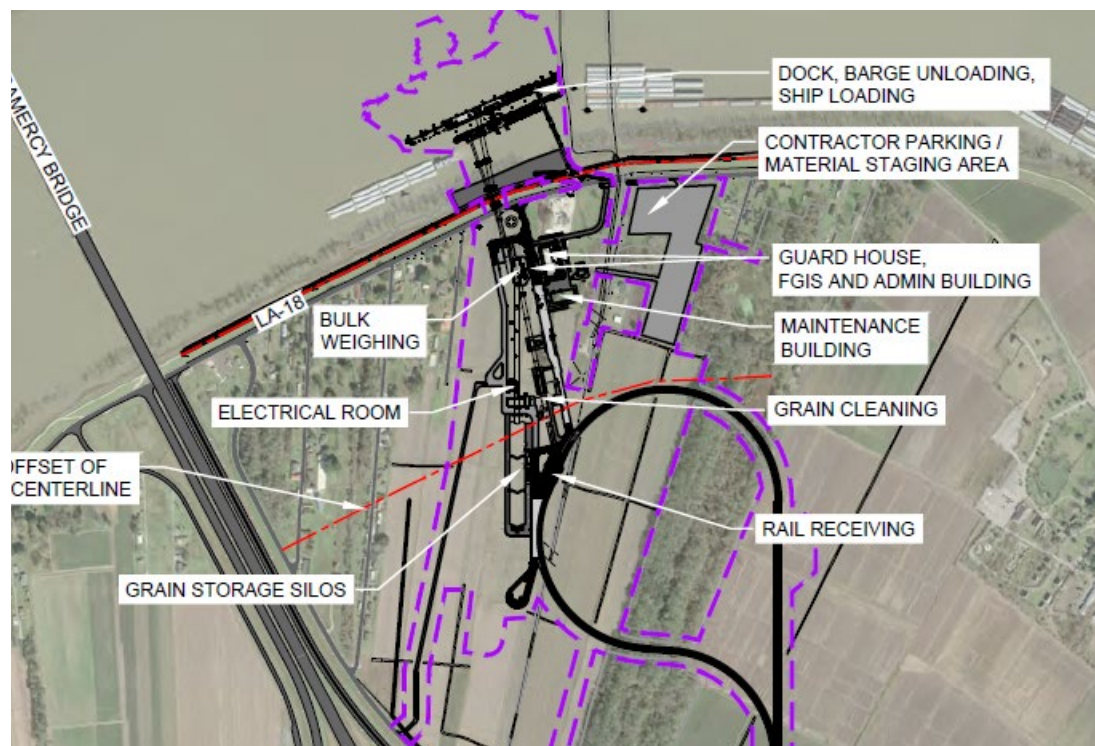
Snapshot of Facility Site Plan as submitted to US Army Corps.
